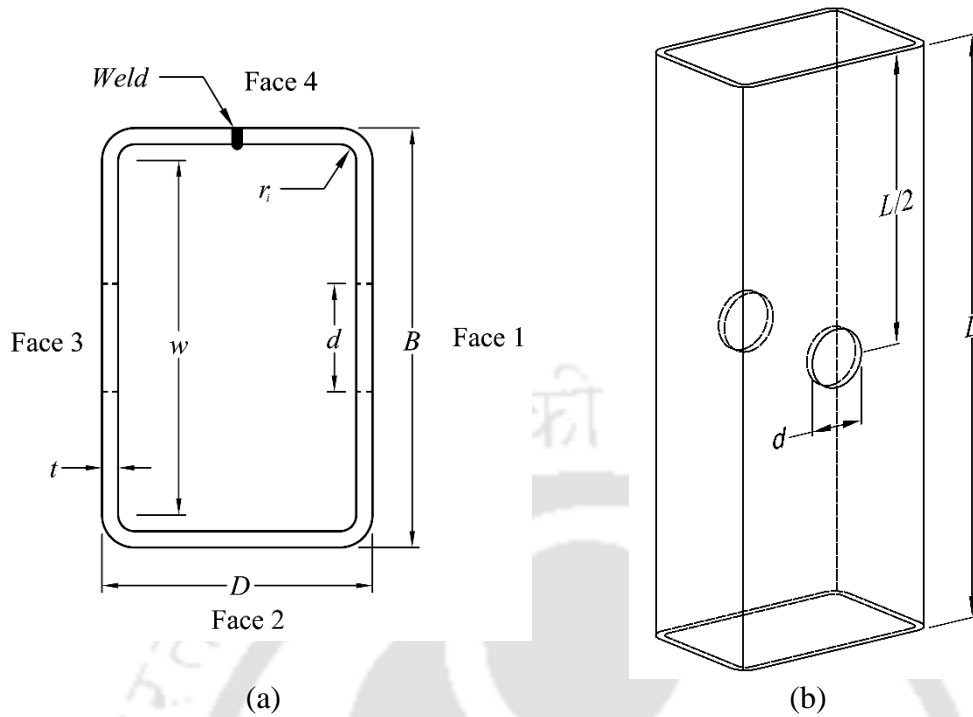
Section definitions of perforated stub column: (a) plan and (b) three dimensional views
